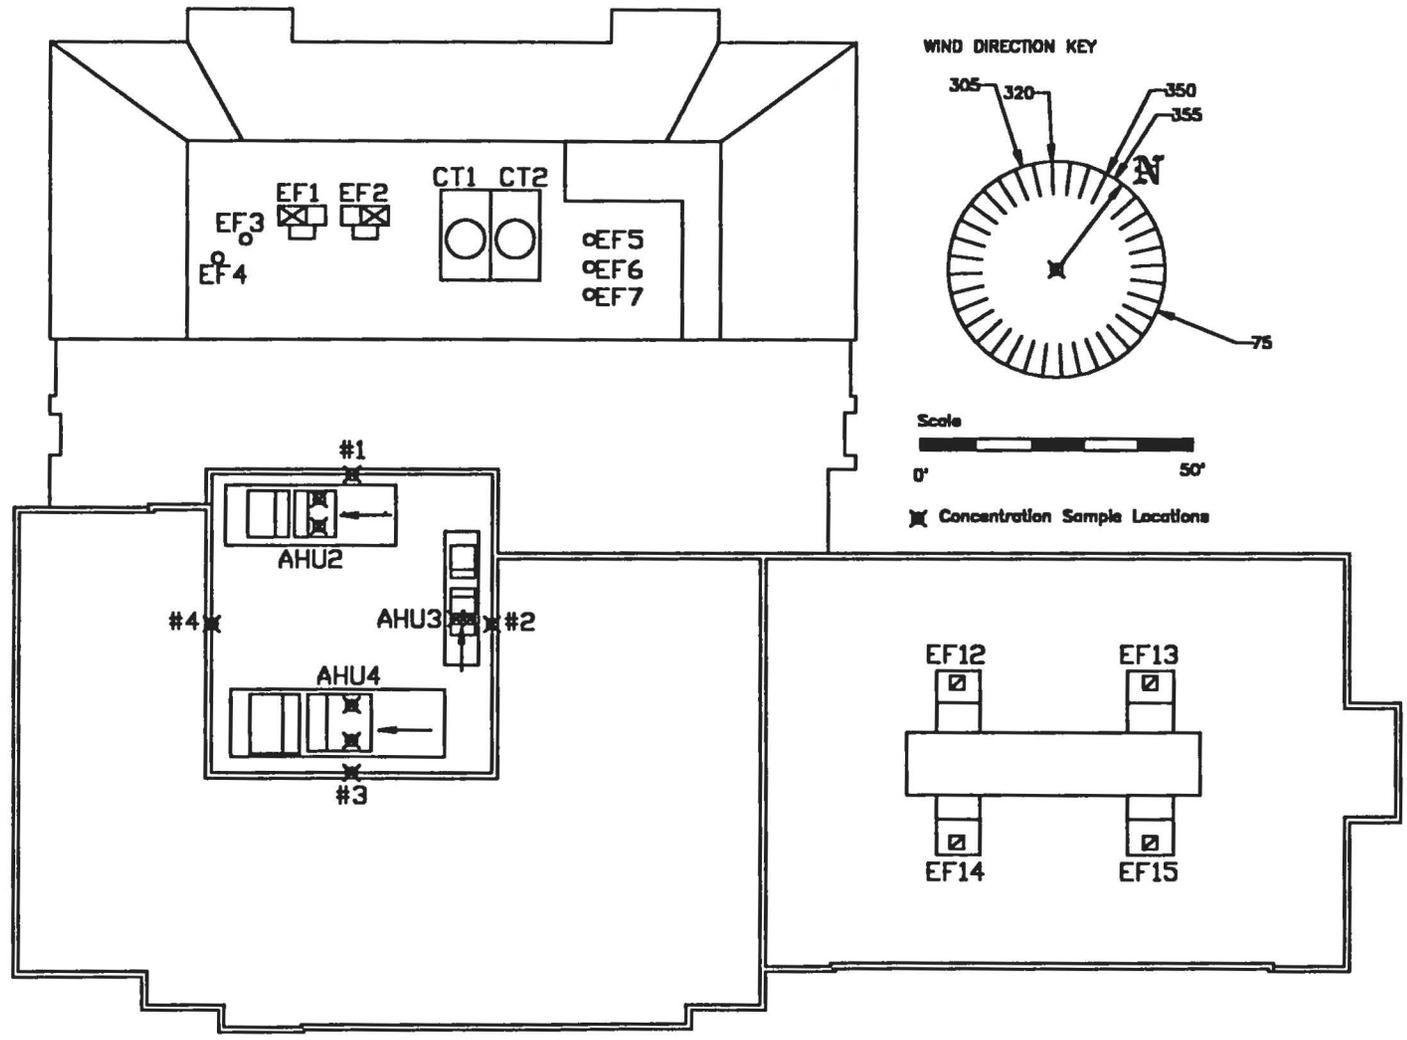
Coolbaugh Hall Roof Intake and Exhaust Drawing
